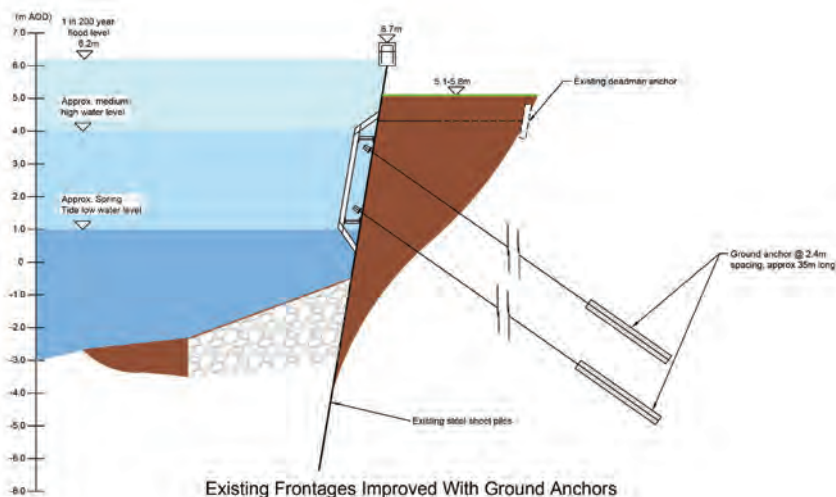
Existing frontages were strengthened using one or two rows of ground anchors with waling beams; fenders protect the finished works from river traffic
